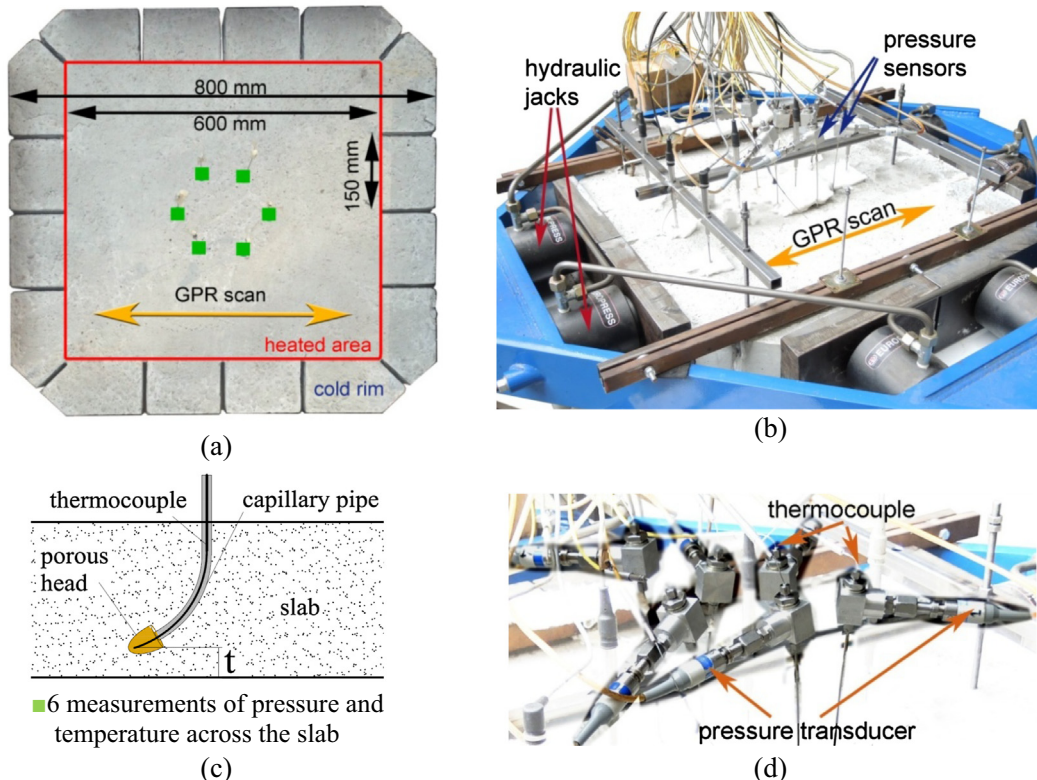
Spalling test on concrete slabs subjected to heating at the bottom and to biaxial membrane load: (a) slab and measuring points, (b) instrumented slab on the horizontal furnace before testing, and (c, d) details of pressure-temperature sensors.
